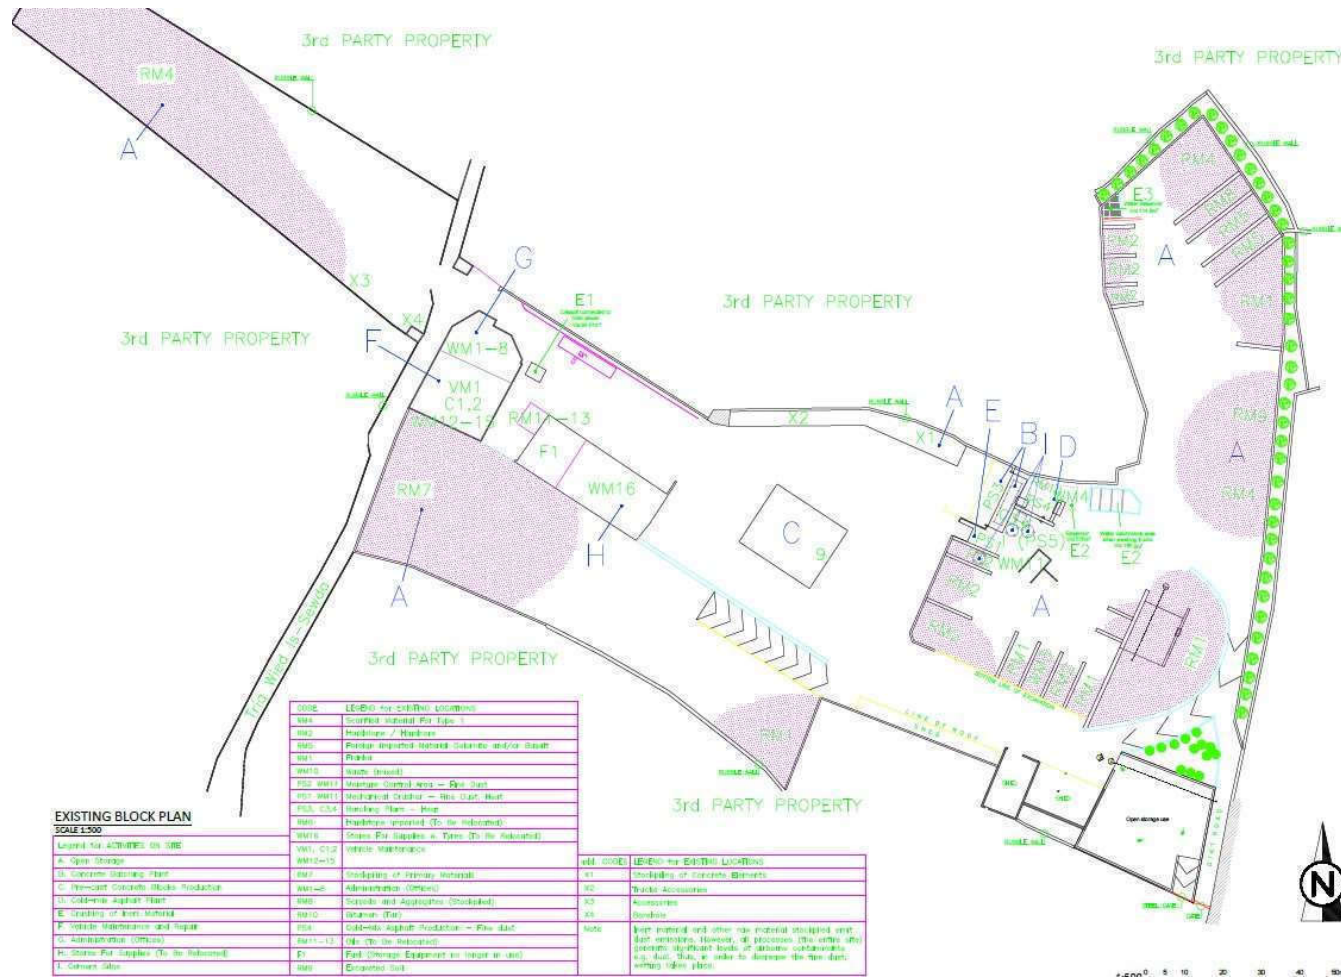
B; Site layout plan showing extent of area authorised for activities specified in Condition 1.1.1
